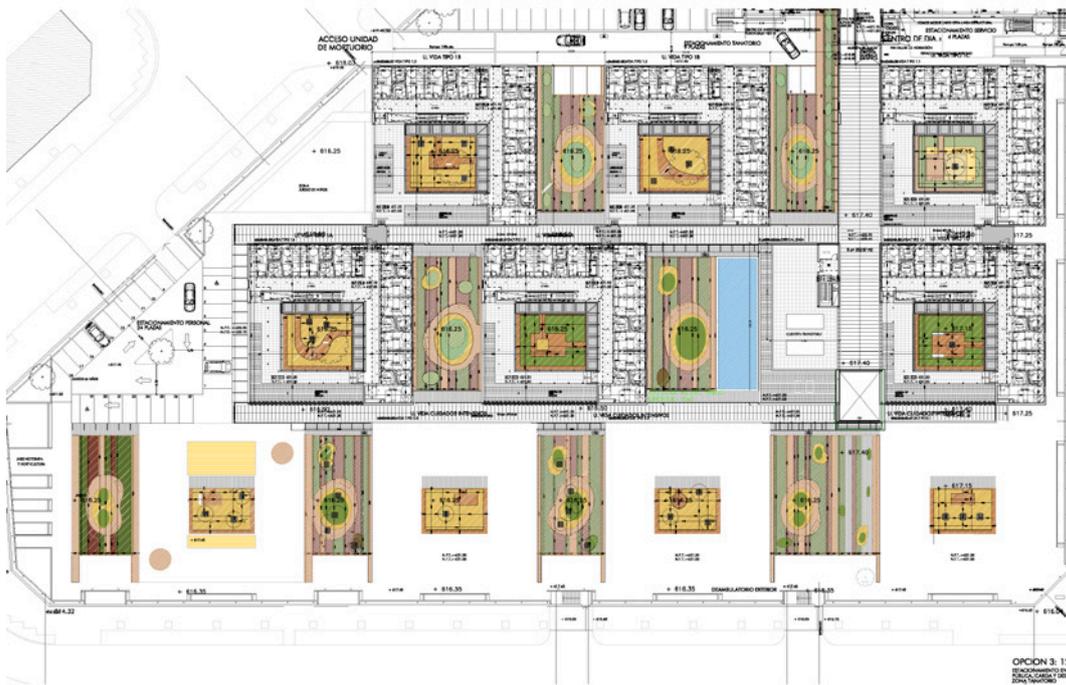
Dry landscape architecture of the Reina Sofia Foundation's Alzheimer Centre (Madrid, Spain), (© C. Jorge).
